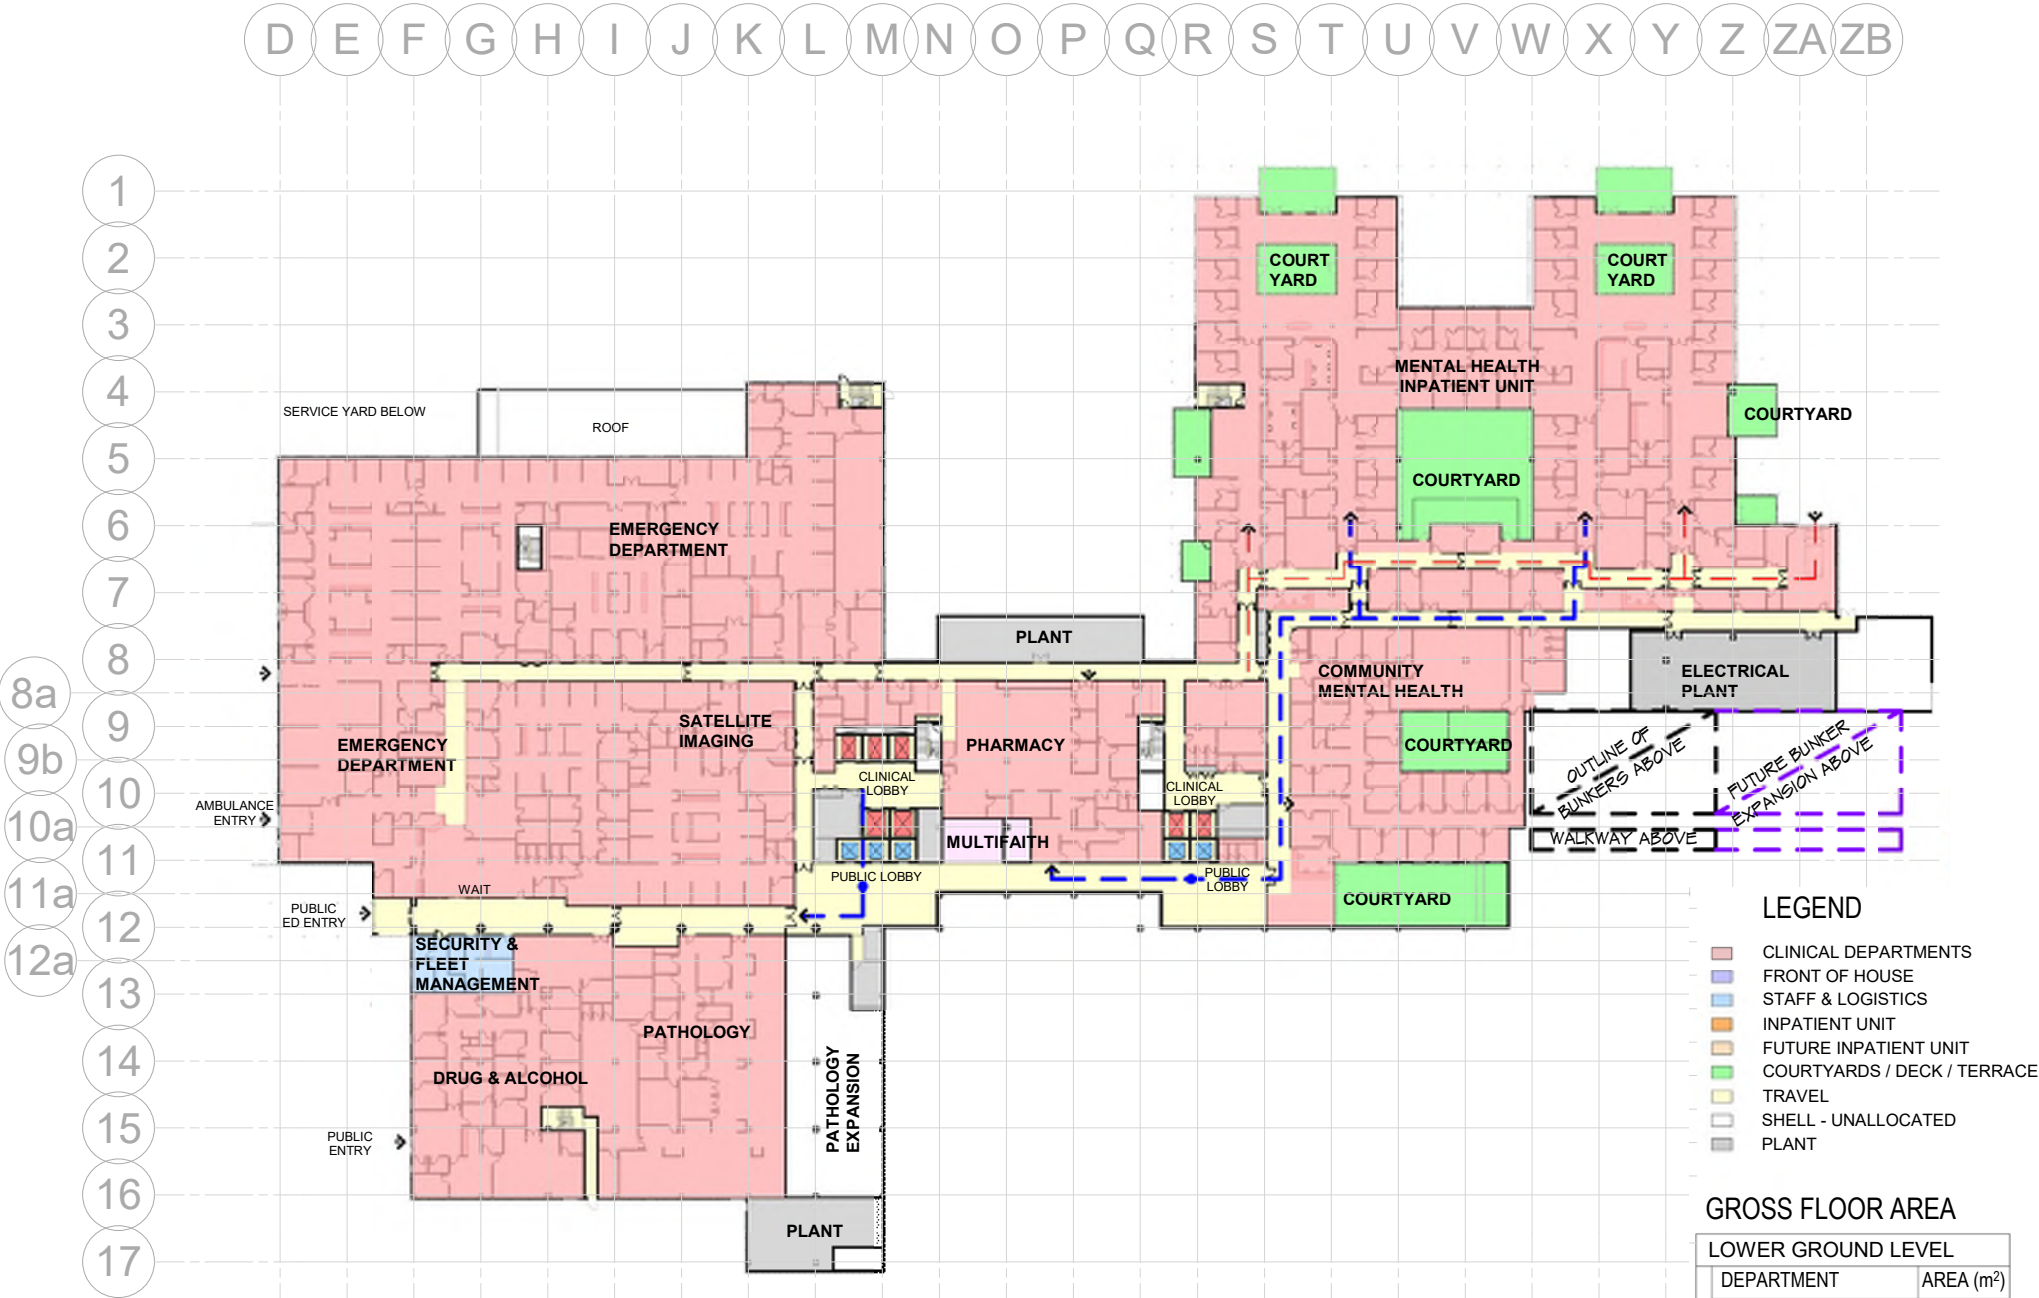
Floor Plan - Lower Ground Level, Block & Stack
